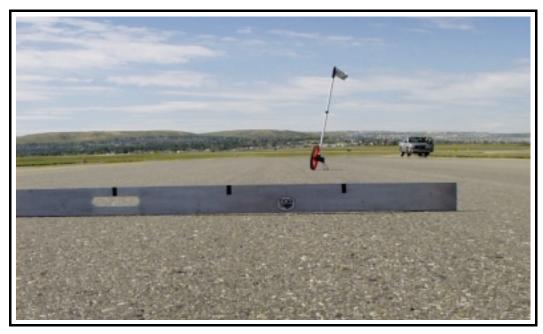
Very minor depression along longitudinal joint with low severity ravelling/weathering in PG Test Section - September 2000
